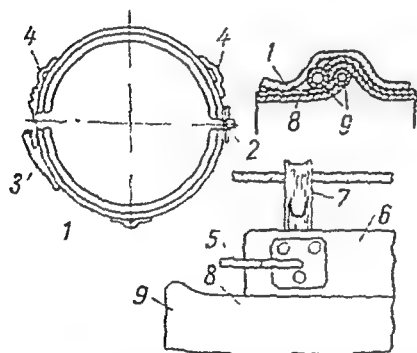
Jointing of rubberized textile ducting by spring steel rings.
